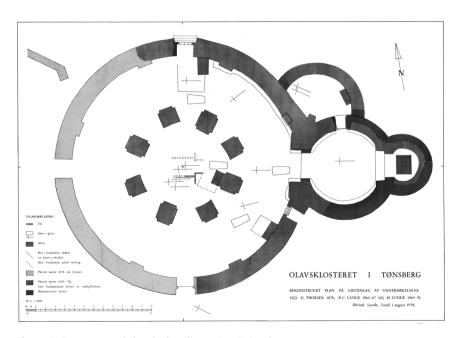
Reconstructed church plan. Illustration: Ø. Lunde.
